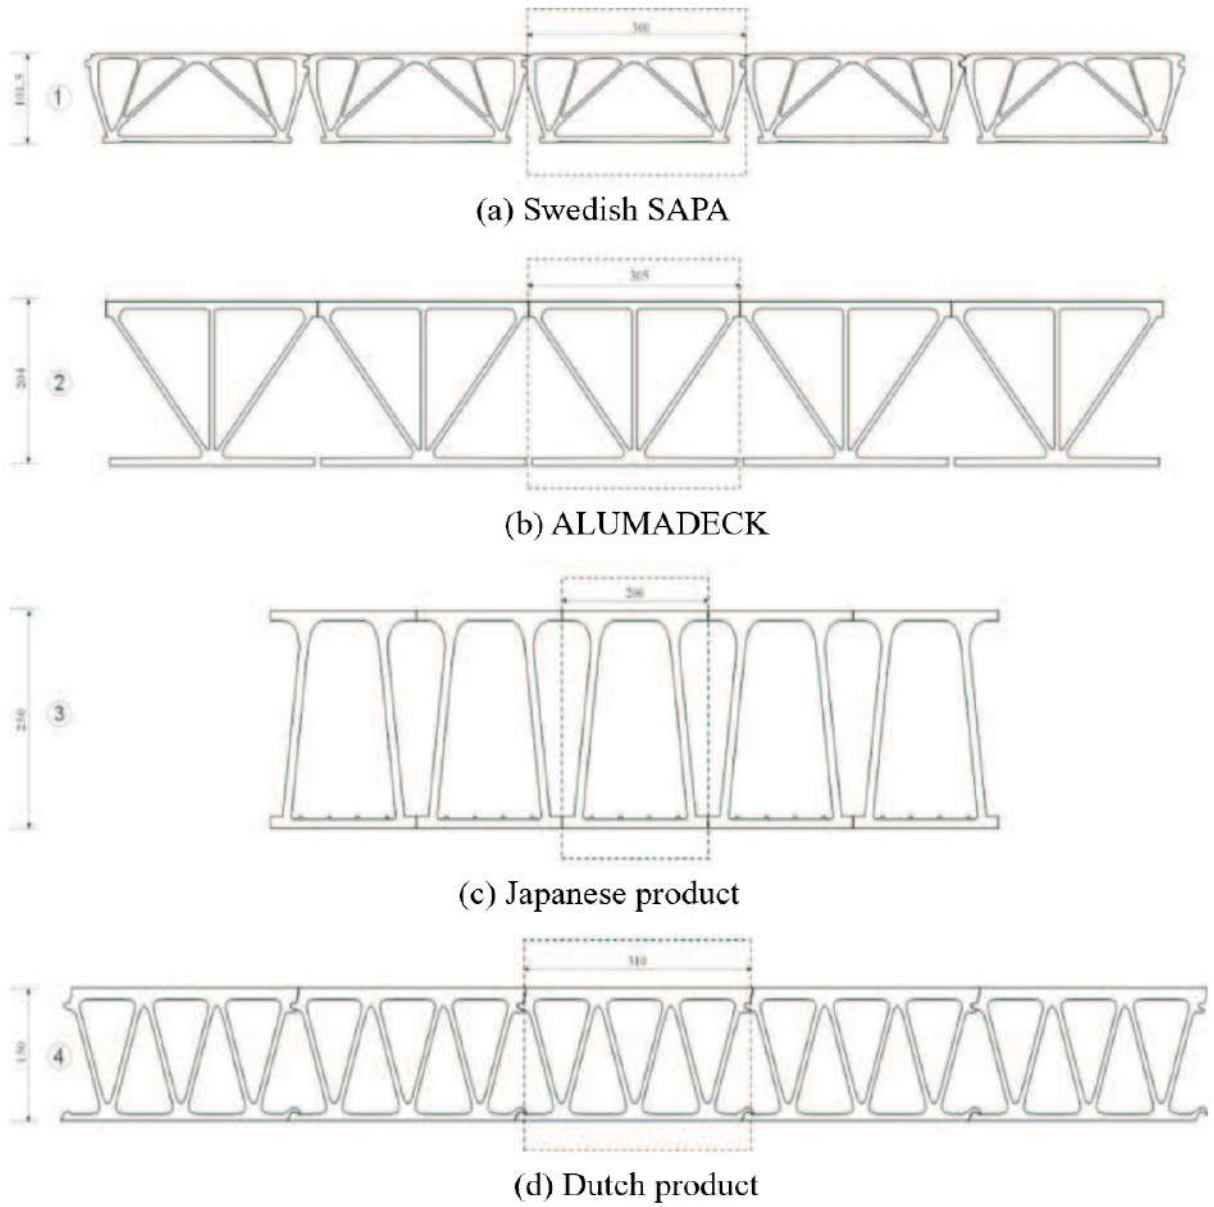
Cross-sections for several extruded bridge decks. [29]
